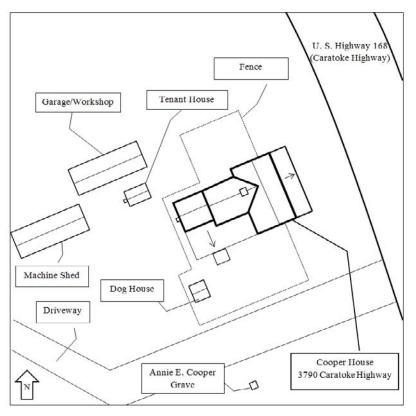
Cooper House Site Plan, Not Drawn to Scale.
